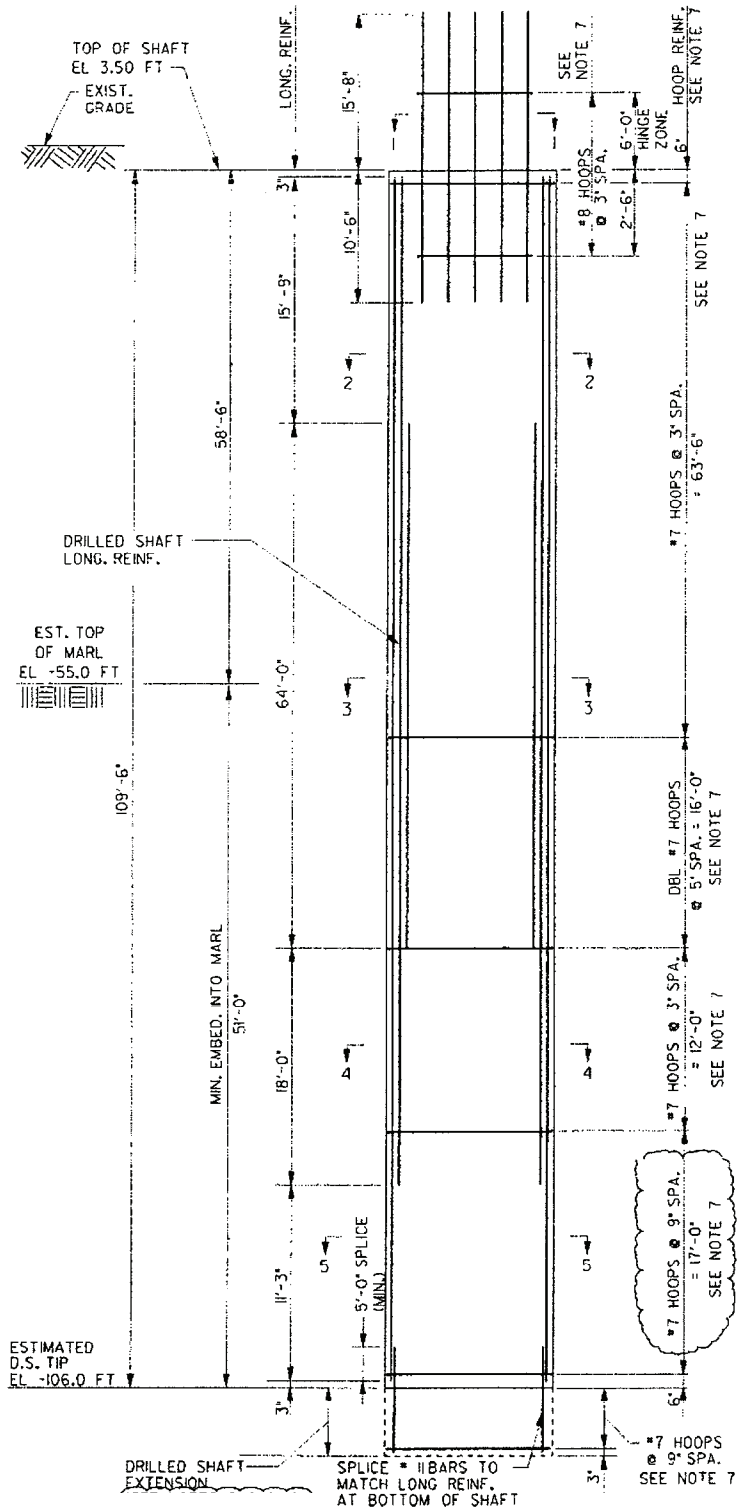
Sample Elevation of Drilled Shaft without Casing
